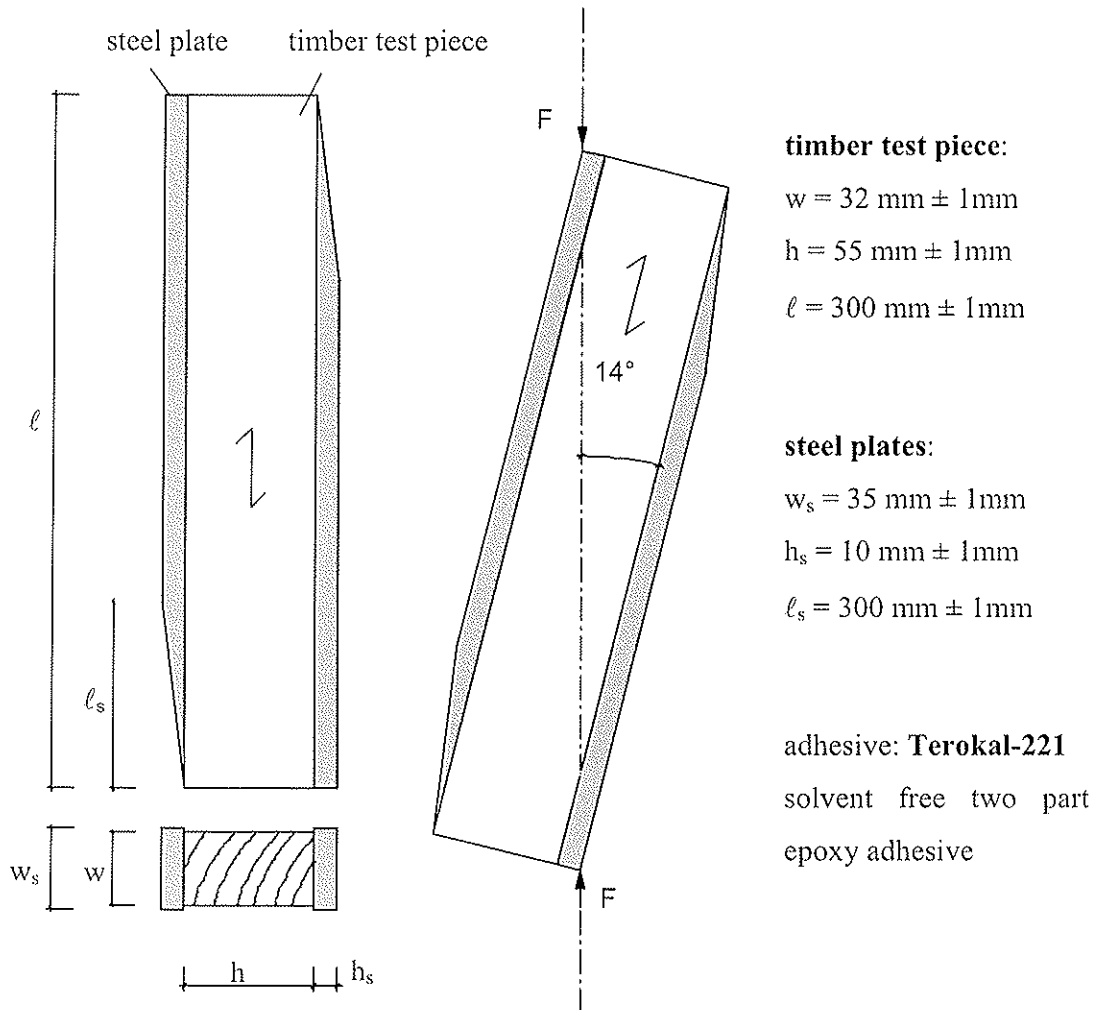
Timber test piece and loading arrangement according to EN 1193.
